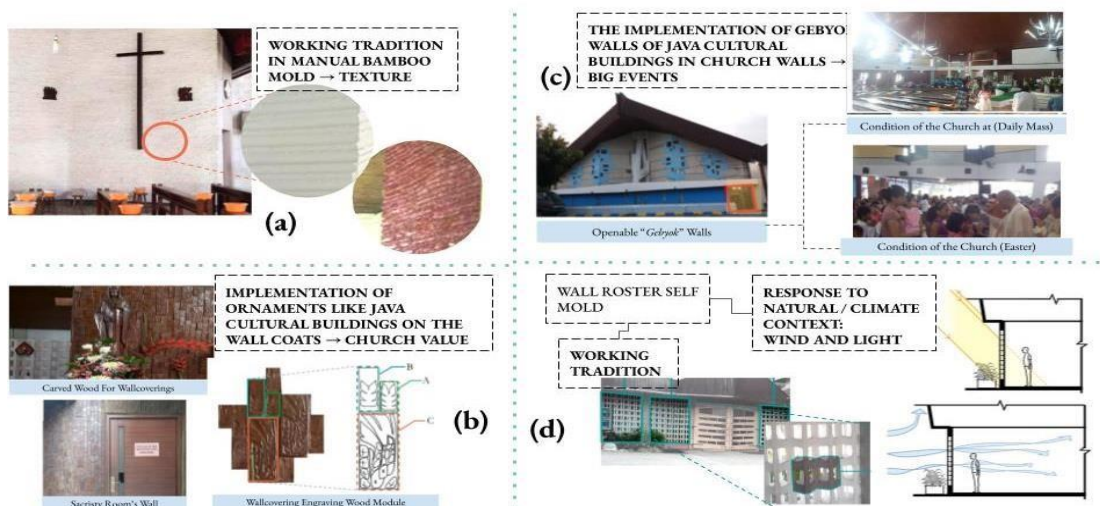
Wall's Texture (a), Wall's Ornaments (b), The "Gebyok" Wall (c), The Roster Wall (d)
